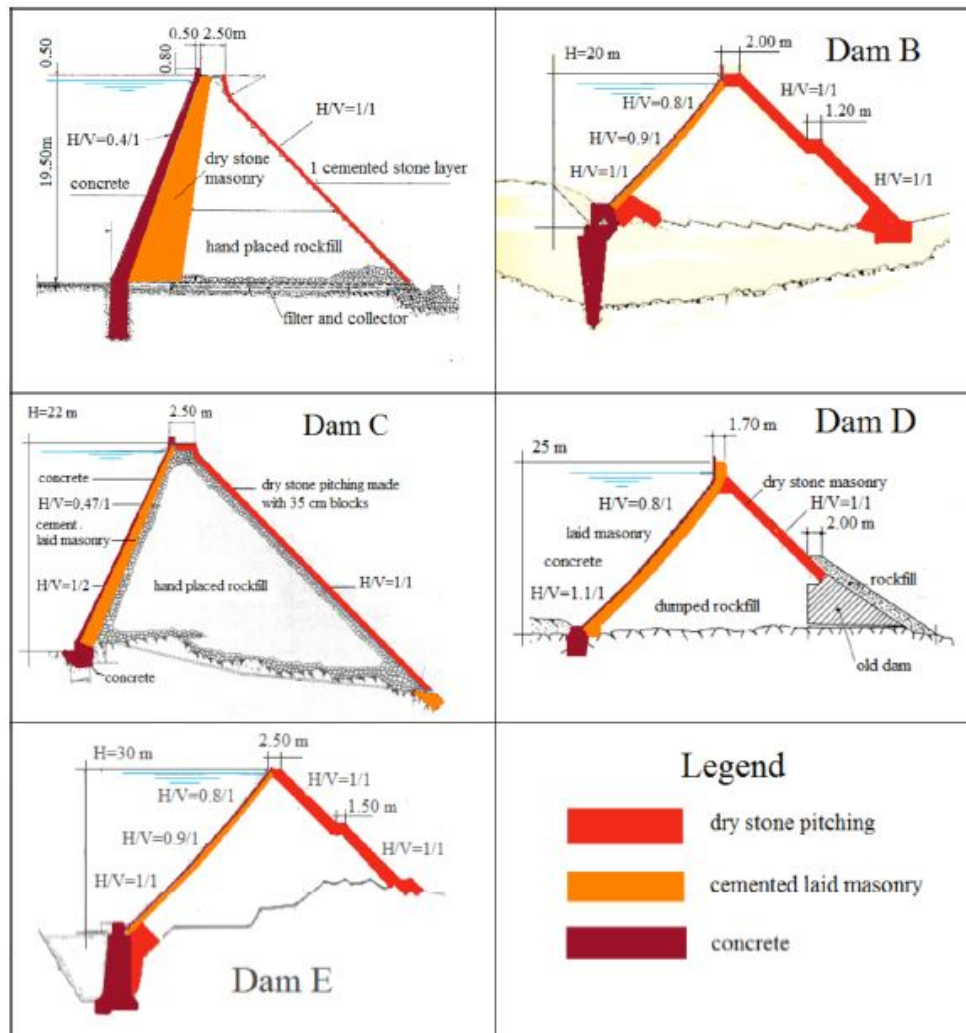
Cross sections of some of the dams with dry-stone pitching that are operated by EDF [2]
